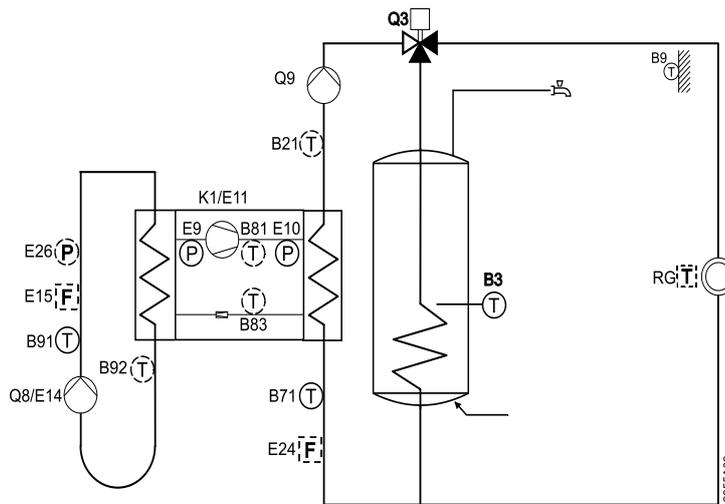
DHW storage tank and space heating without a buffer storage tank (additional storage tank)
